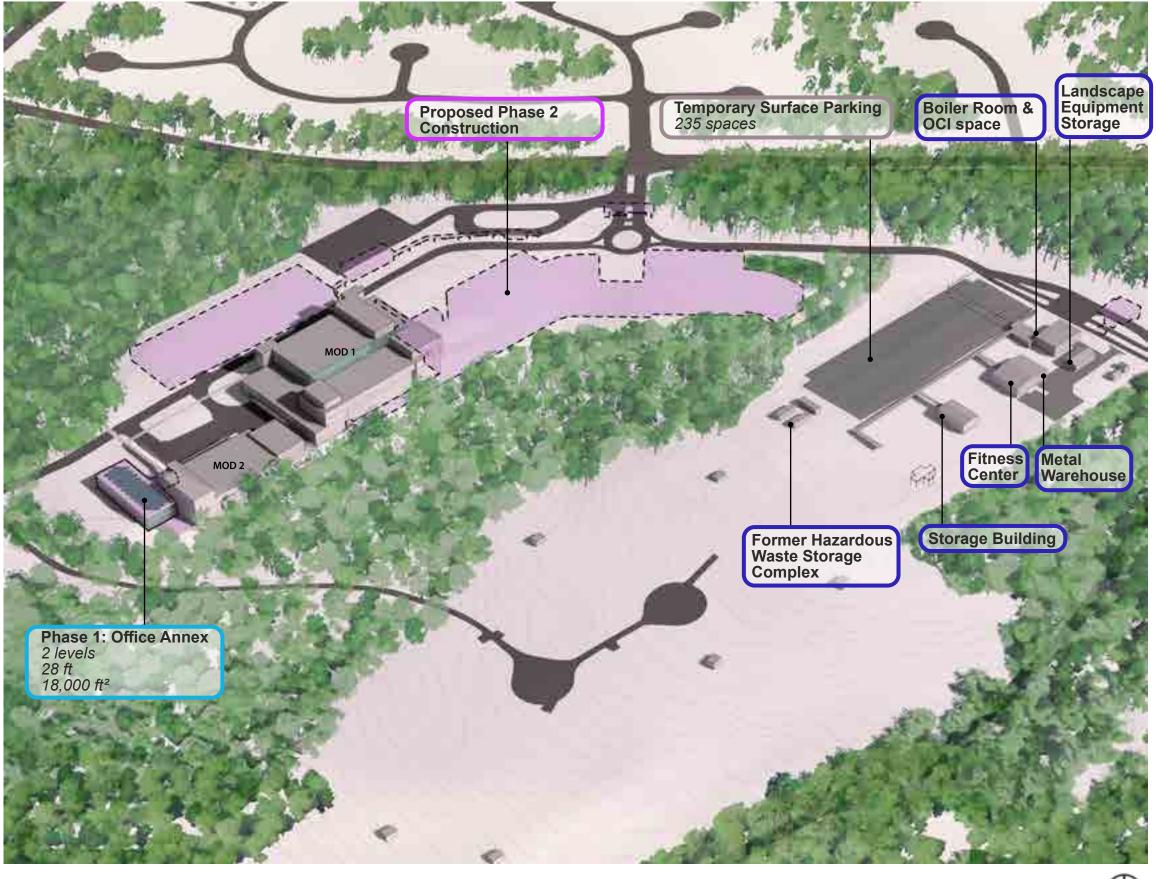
Preferred Alternative B3 section intermediary Phase
